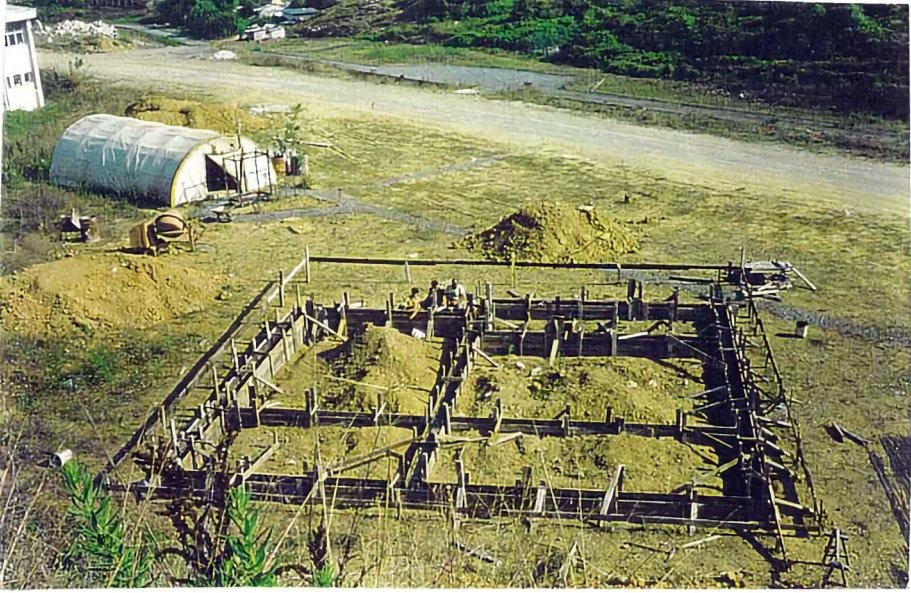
İNTAG TOKİ 622 Gypsum Stabilized Adobe Building Project
